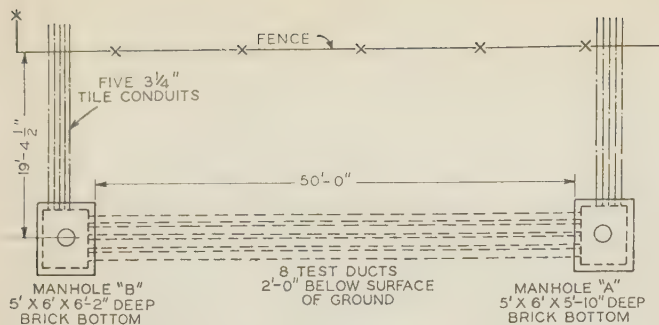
Plan showing duct and manhole arrangement for conducting tests on cables at No. 5 substation
